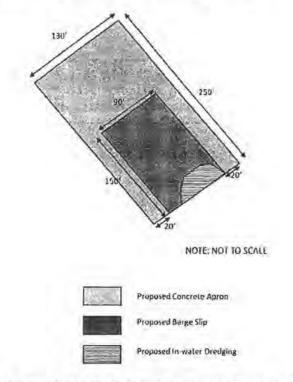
2: Turkey Point Units 6 & 7 Equipment Barge Unloading Area – Excavation and Regrading Areas
